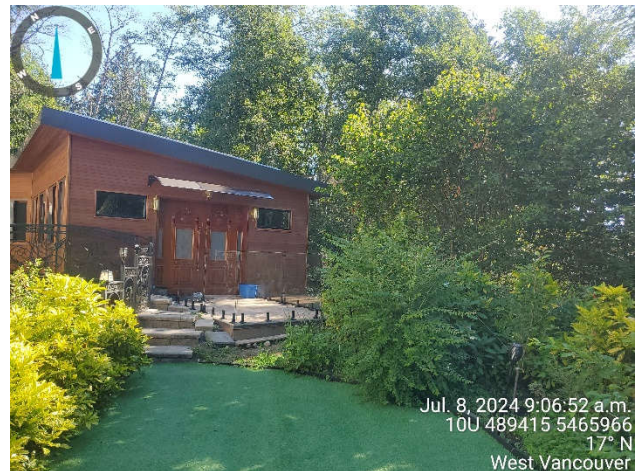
View of small deck south of the unpermitted building, and the fake turf located in the 5-m Setback.
